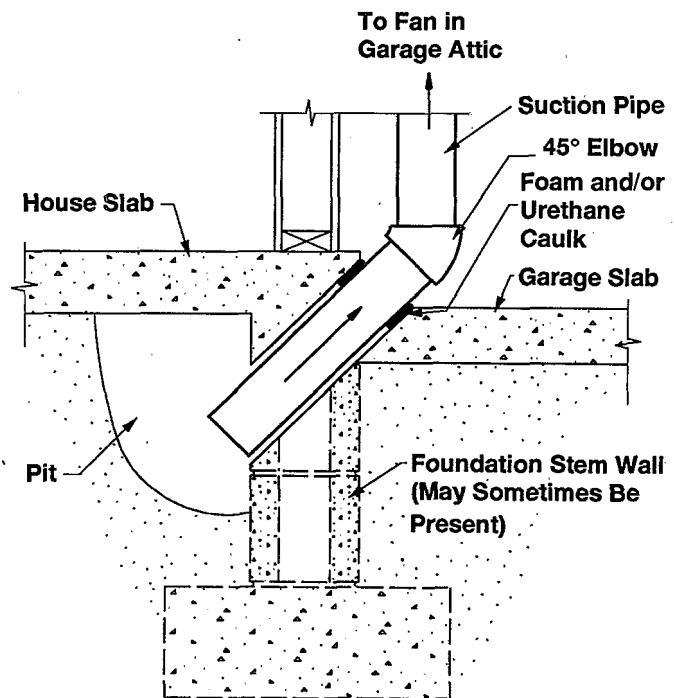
One possible method for angling a suction pipe beneath the living-area slab of a slab-on-grade house, from inside an adjoining garage (adapted from Reference Fo90).
